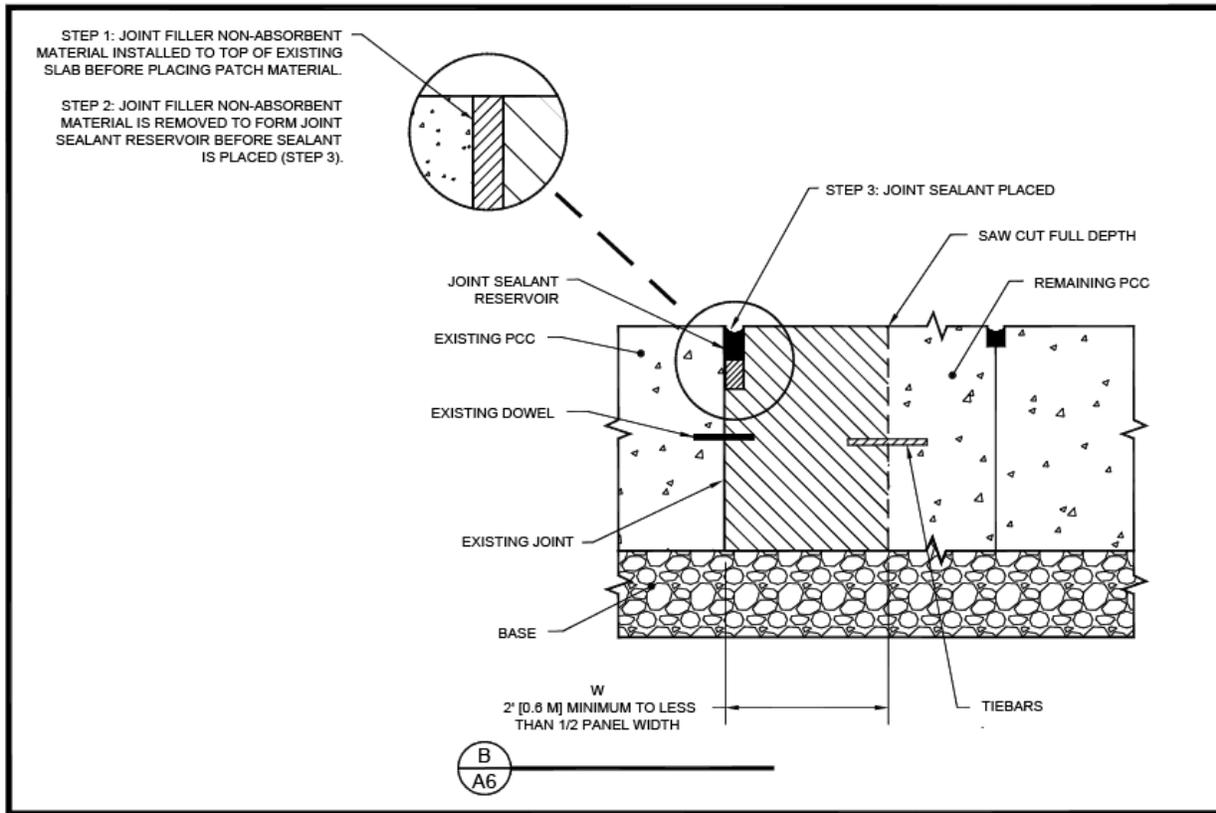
Full depth repair in rigid pavement – partial slab replacement
